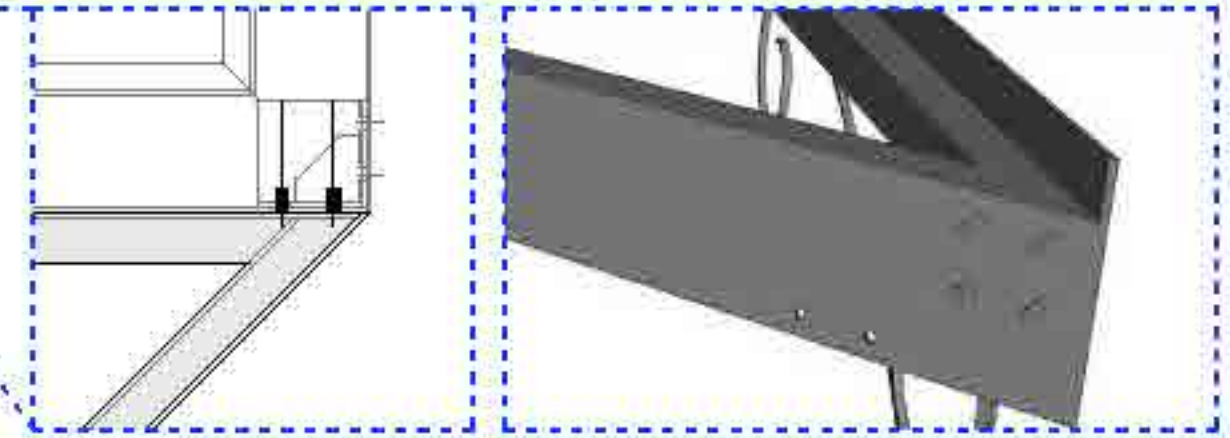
PLATE CONNECTING THE 4 RING BEAM PROFILES scale 1:2
